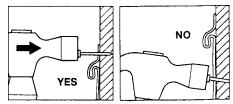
Face Nailing of Vinyl Siding Prohibited
